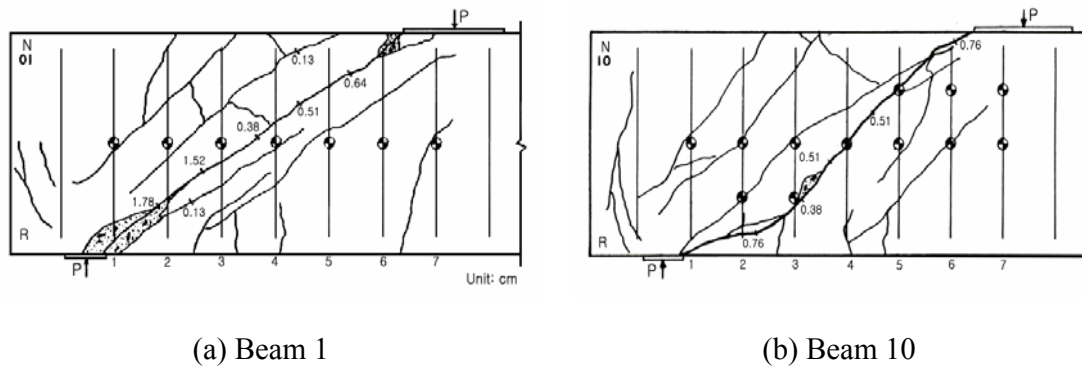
Test specimens of reinforced concrete beams (Adapted from Ref. [4])
